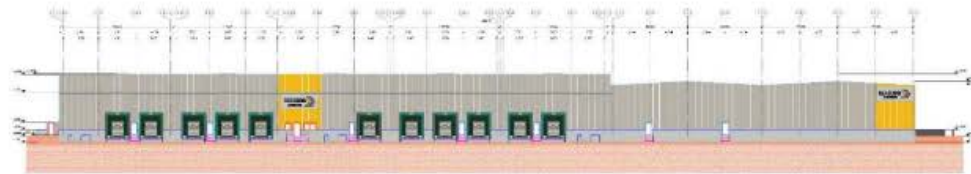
DETAILED DESIGN - DESIGN OF NEW INDUSTRIAL BUILDING WITH COOLING, MEP BUILDING AND ADMINISTRATION BUILDING: 46000 m²
